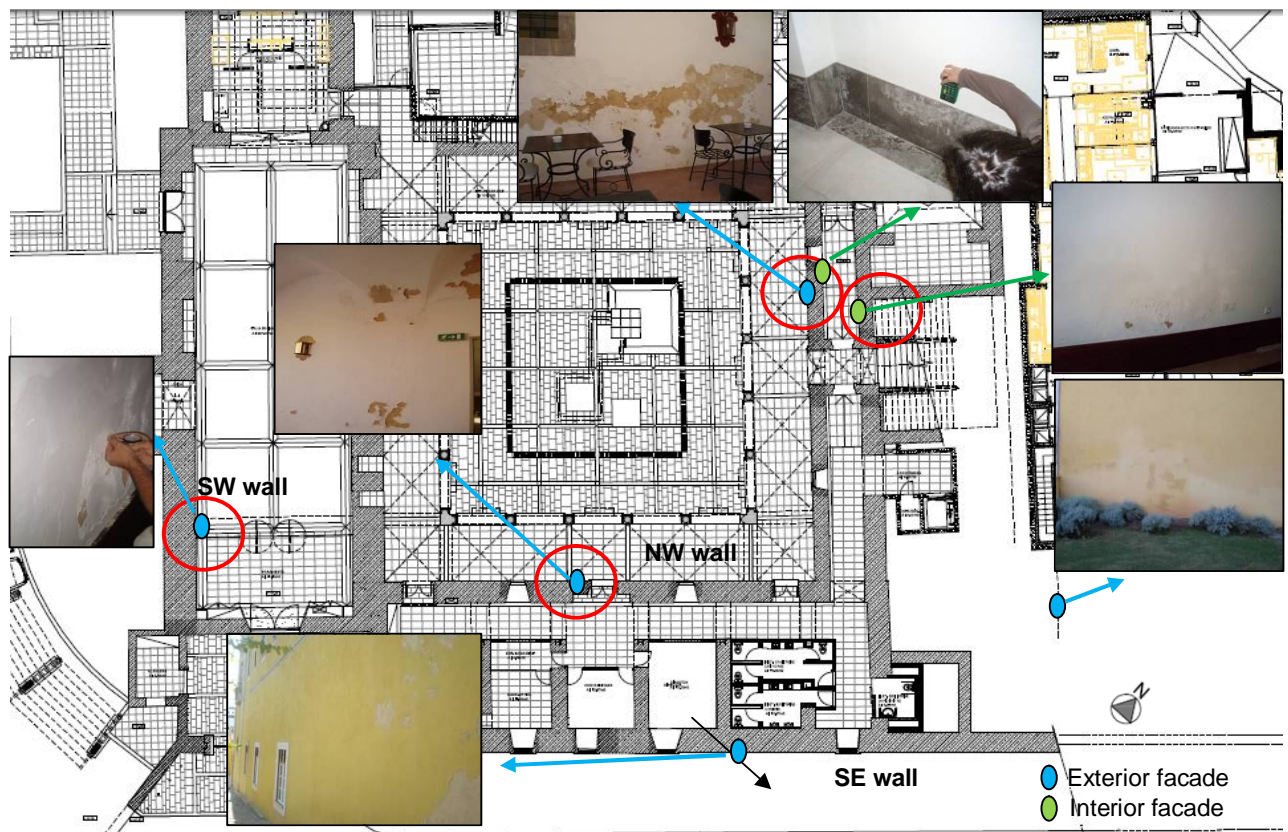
In situ tests localization in the plan – Tavira Convent
